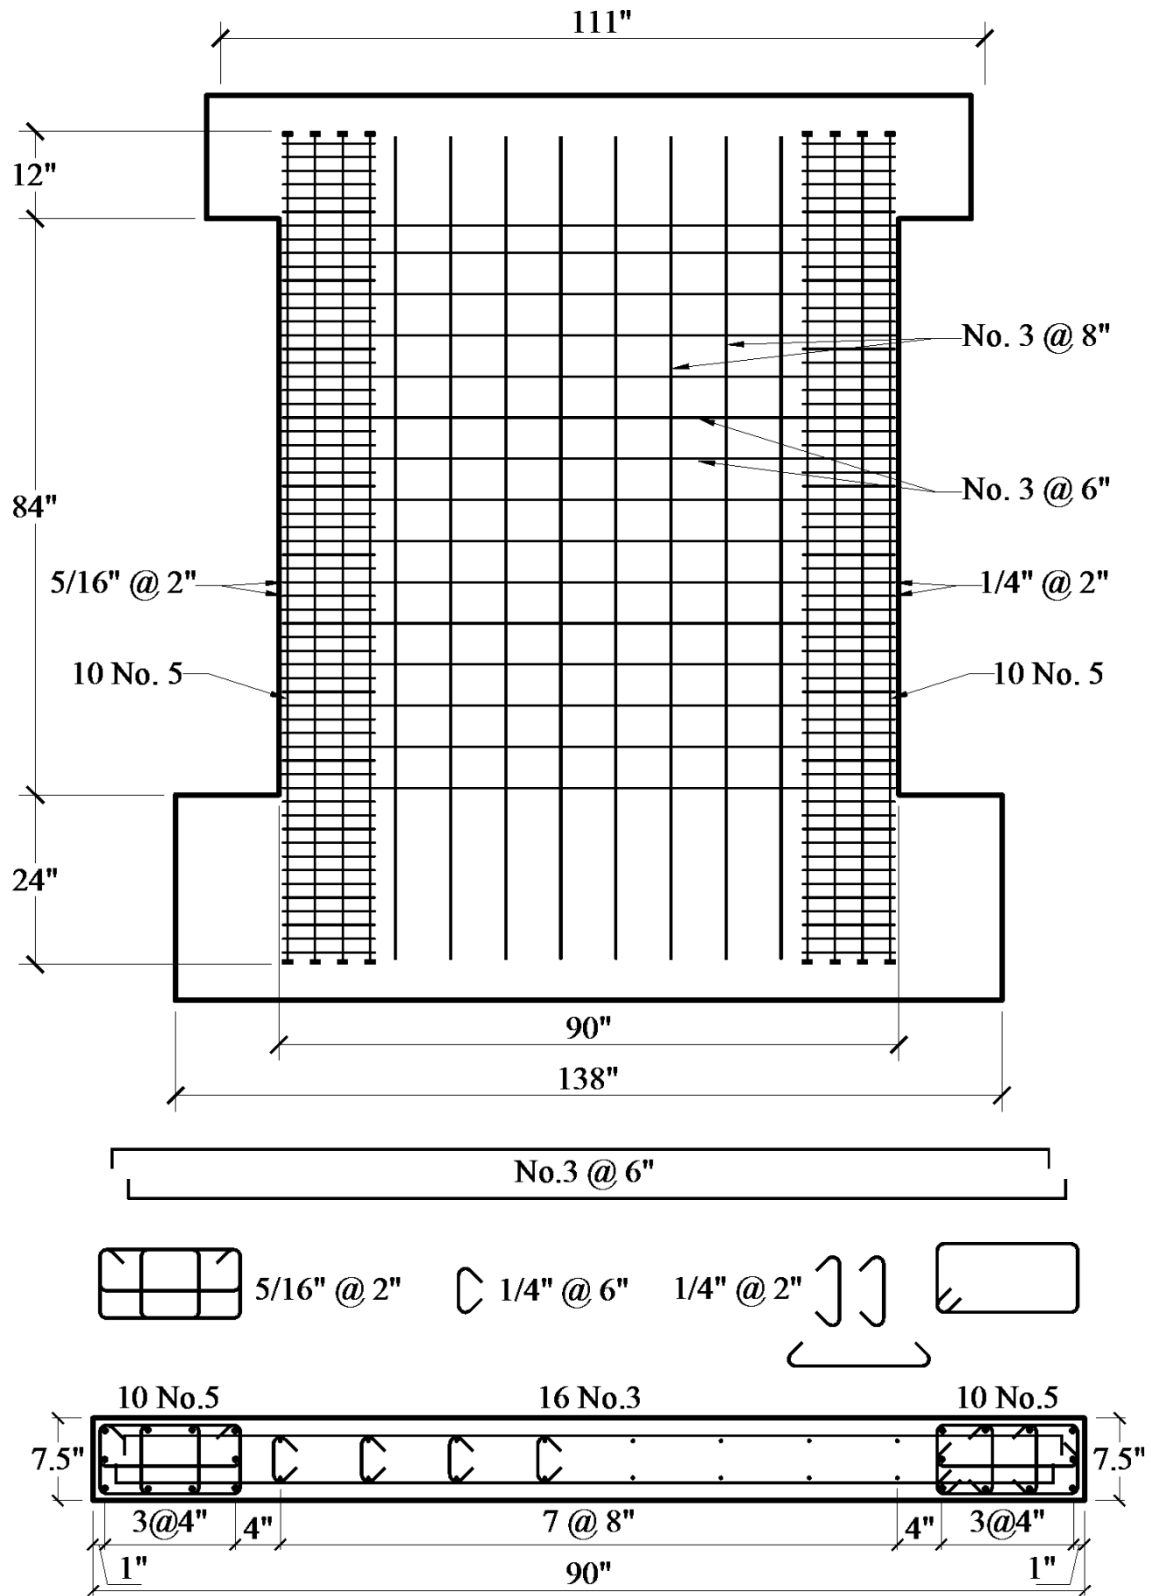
Specimen WP6 reinforcement (Conversion: 1"=25.4 mm)
